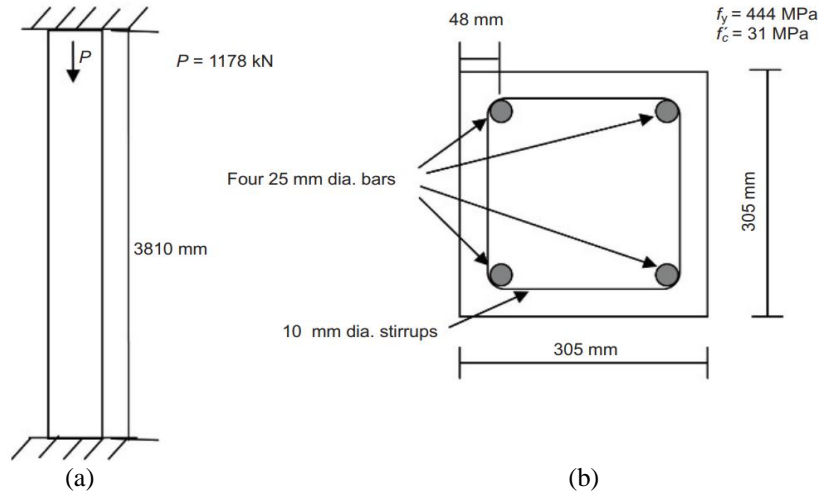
(a) Elevation (b) Cross sectional details of the column
